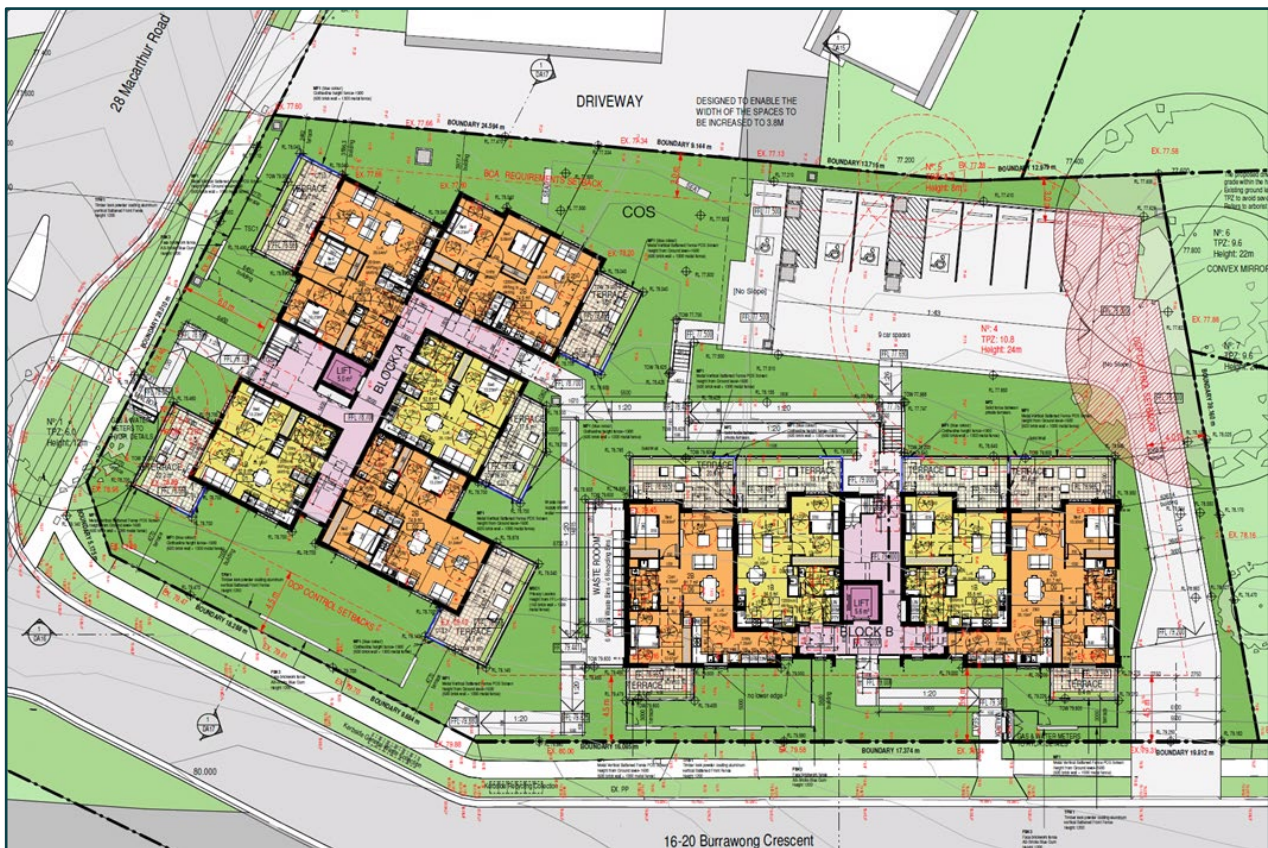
Extract from Architectural Plans – Ground Level (Source: Architectural Plans, Morson Group, dated 11/10/2023)
